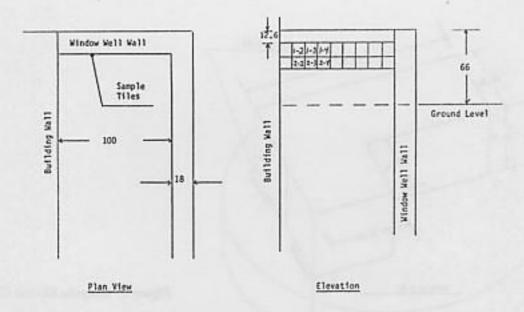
Chugoku Electric Company detail. Sample location 2-01, window well (dimensions in cm)
